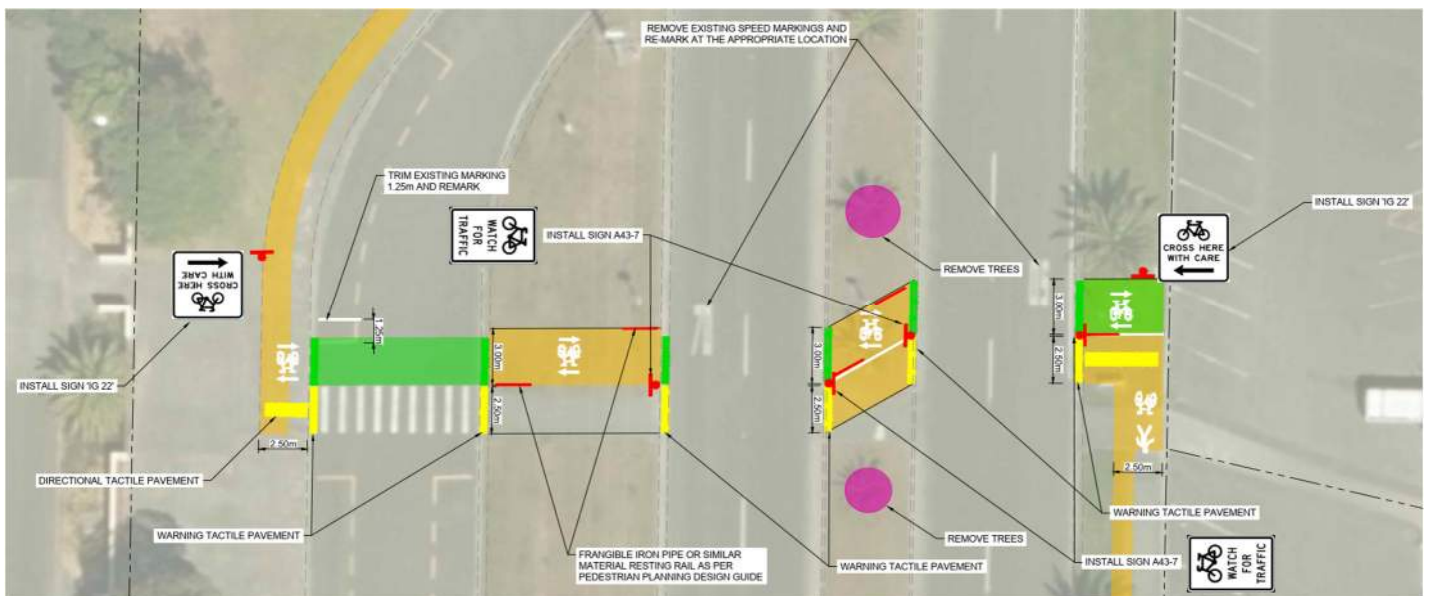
Proposed plan of the crossing point on Peter Snell Drive
